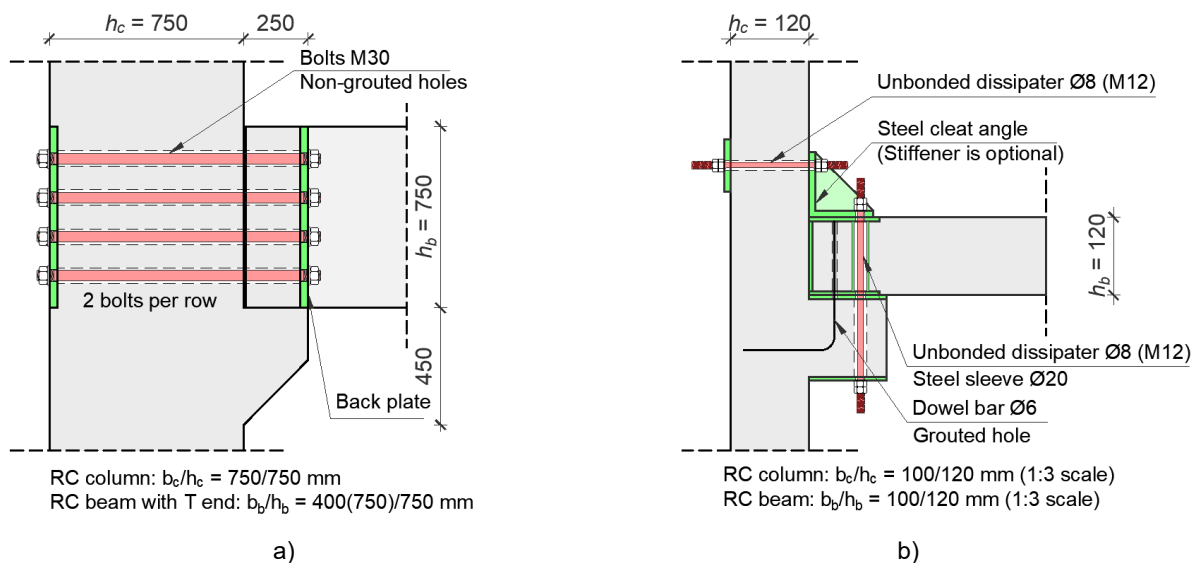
Beam-to-column joints with RC corbels and through bolts: a) adapted from Ding et al. [20], b) adapted from Krishnan and Purushothaman [22]
